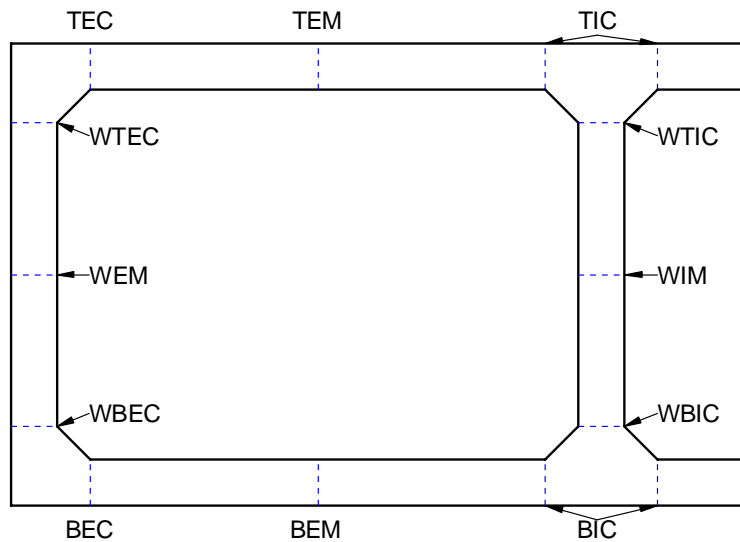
B. MOMENT CRITICAL SECTIONS FOR CULVERTS WITH HAUNCHES.
